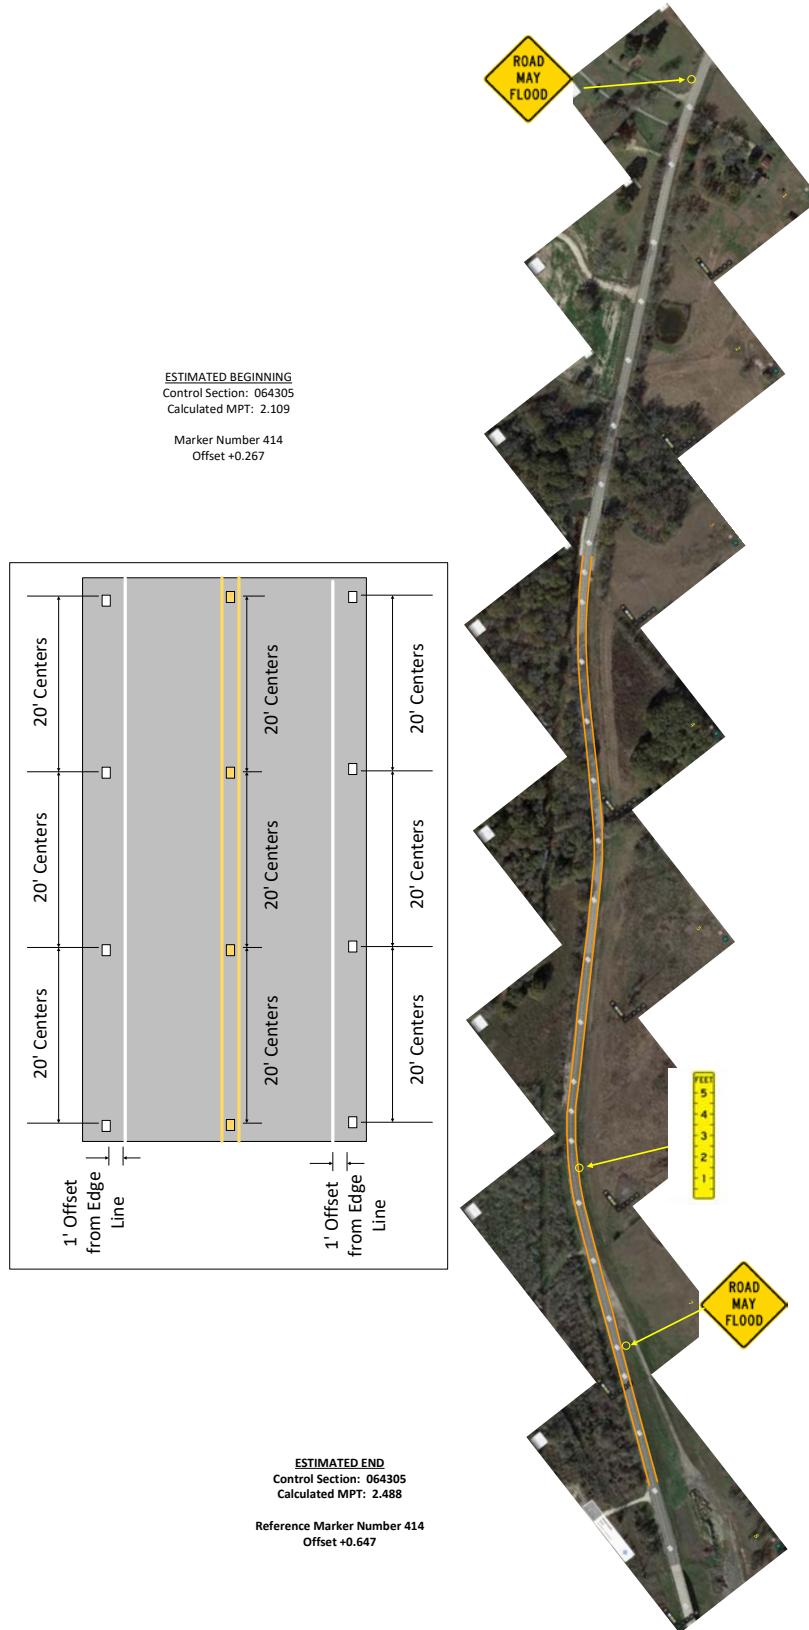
Limits of Proposed Enhanced Pavement Markings for FM 244.
